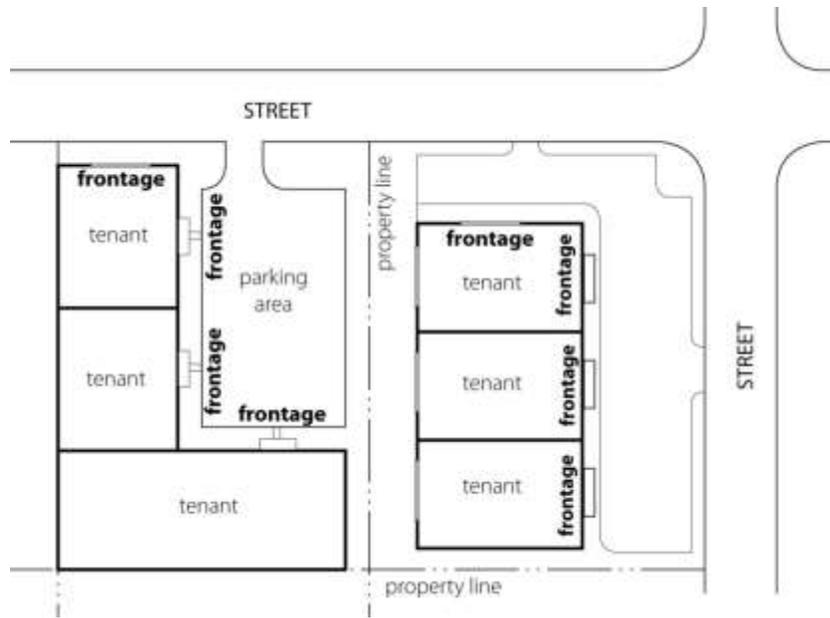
Signs, Measurement Rules, Building Frontage for Buildings With More Than One Tenant
